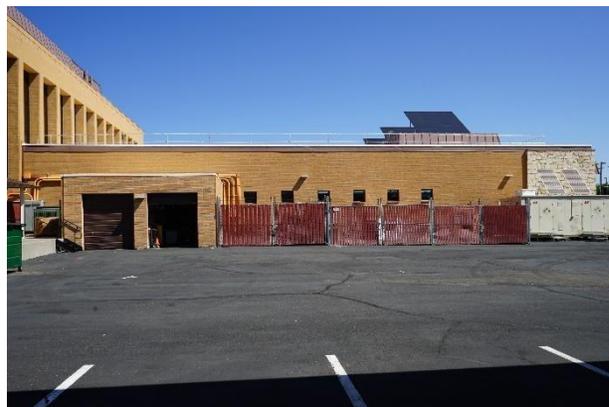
South façade of the Federal Building with the south facades of the primary office wing (left) and setback single-story wing (right), looking north.
